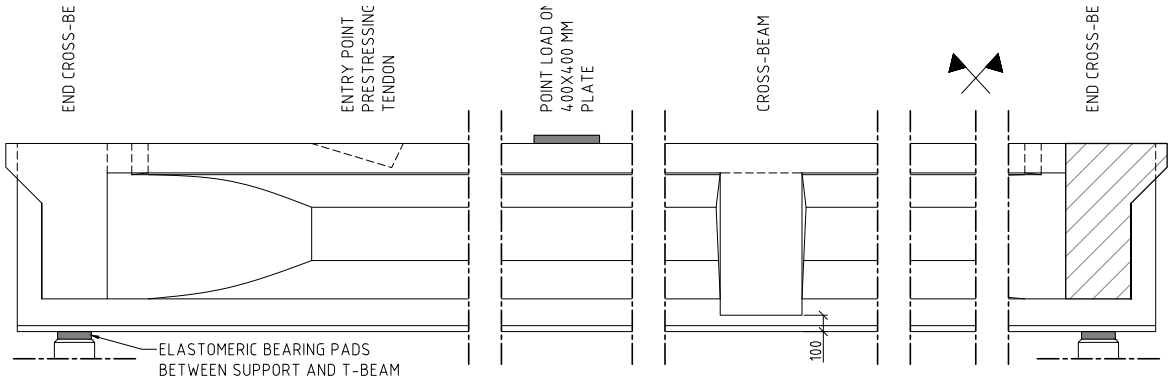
Side view C-C' of single beam connected to end-beam on right hand side
